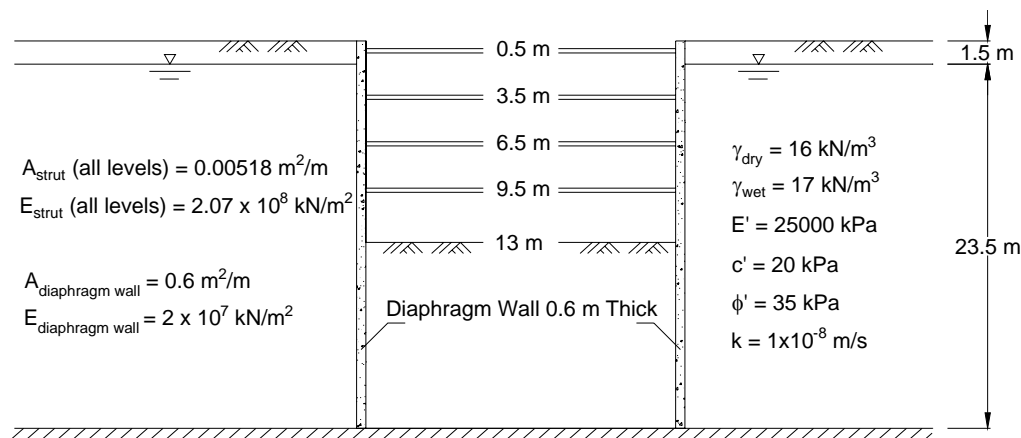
Cross-Section of Example 2: 3-D Hypothetical Excavation
